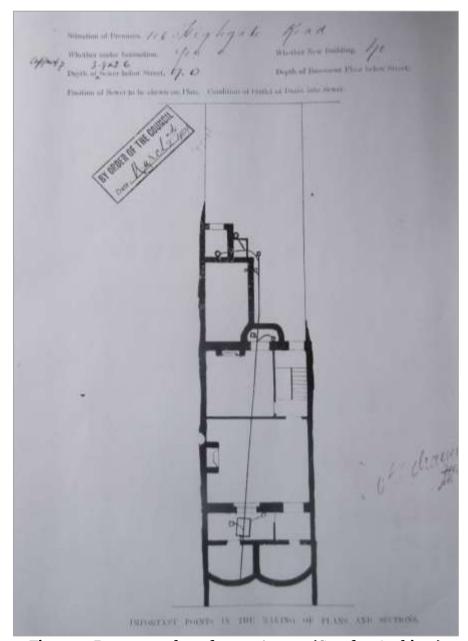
Basement plan of no. 106, 1904 (Camden Archives)
